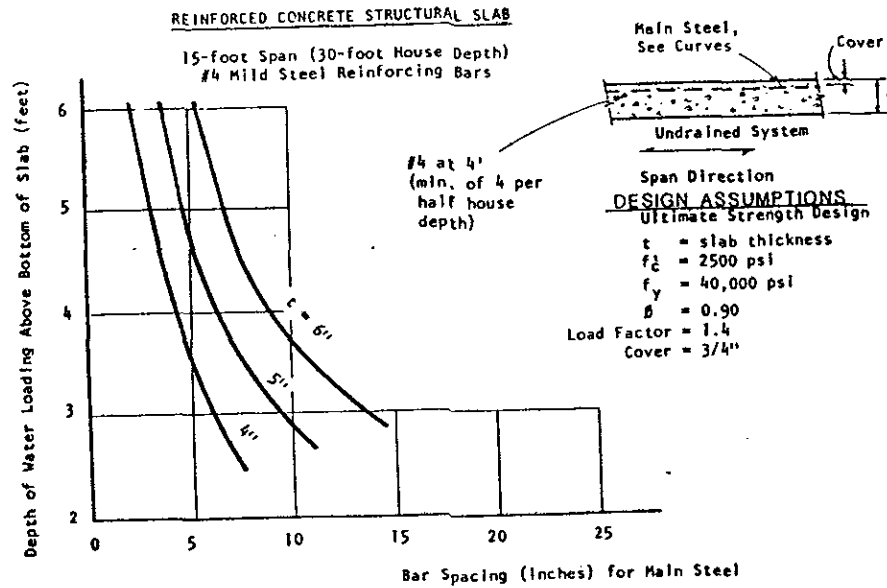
Slab reinforcement design, #4 steel reinforcing bars, 15 foot span. (Reference 26).
